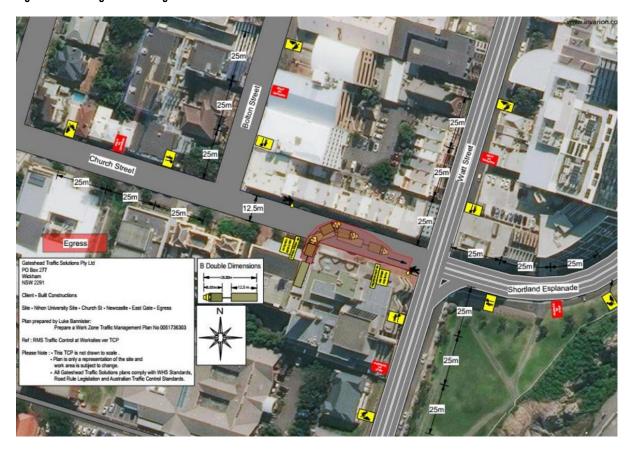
Building A vehicle egress from site to Church Street under traffic control
